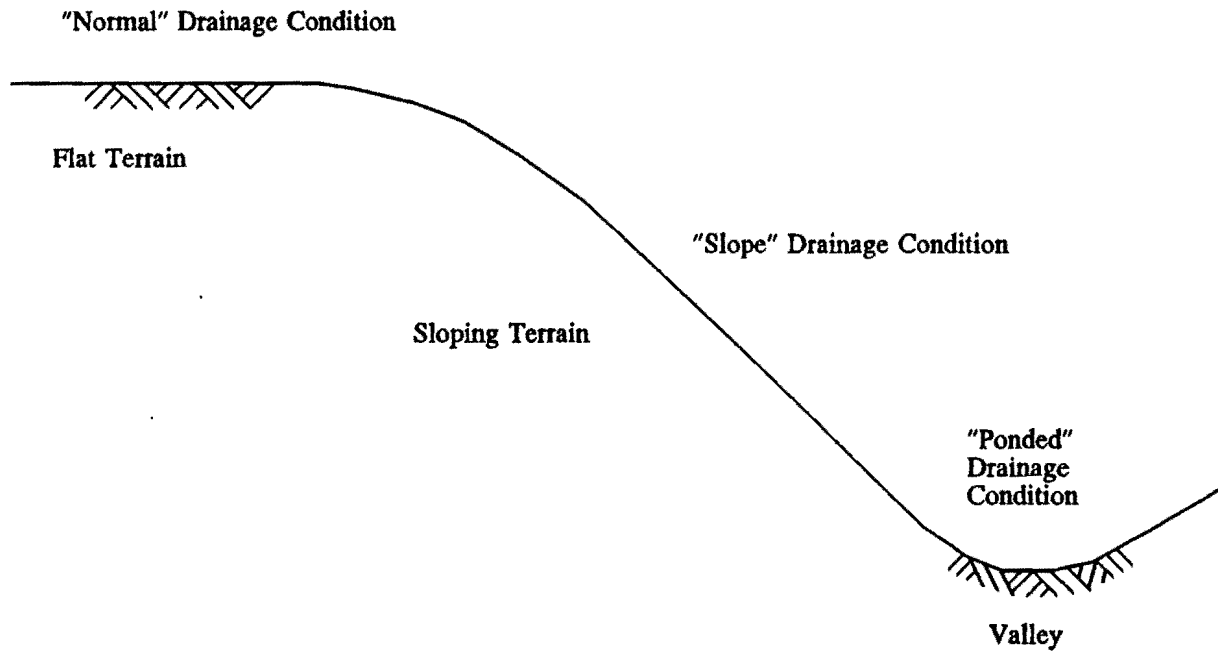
Types of Longitudinal Drainage Conditions along Highway Pavements
